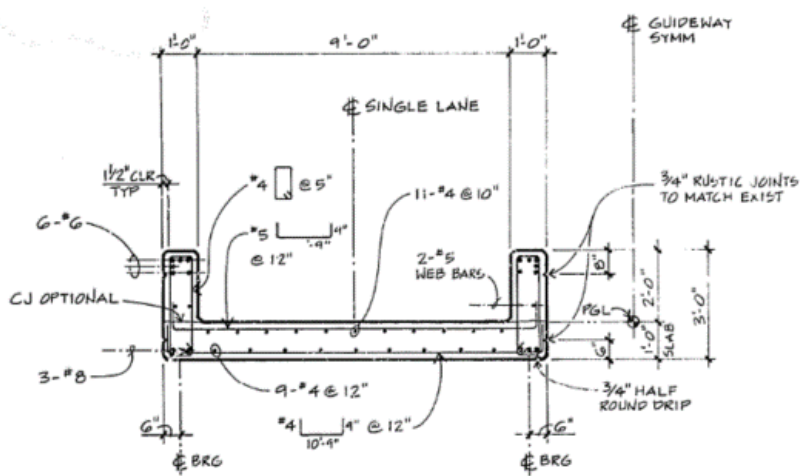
Typical Existing U-Beam Section (Guidance Attachments Not Shown)
